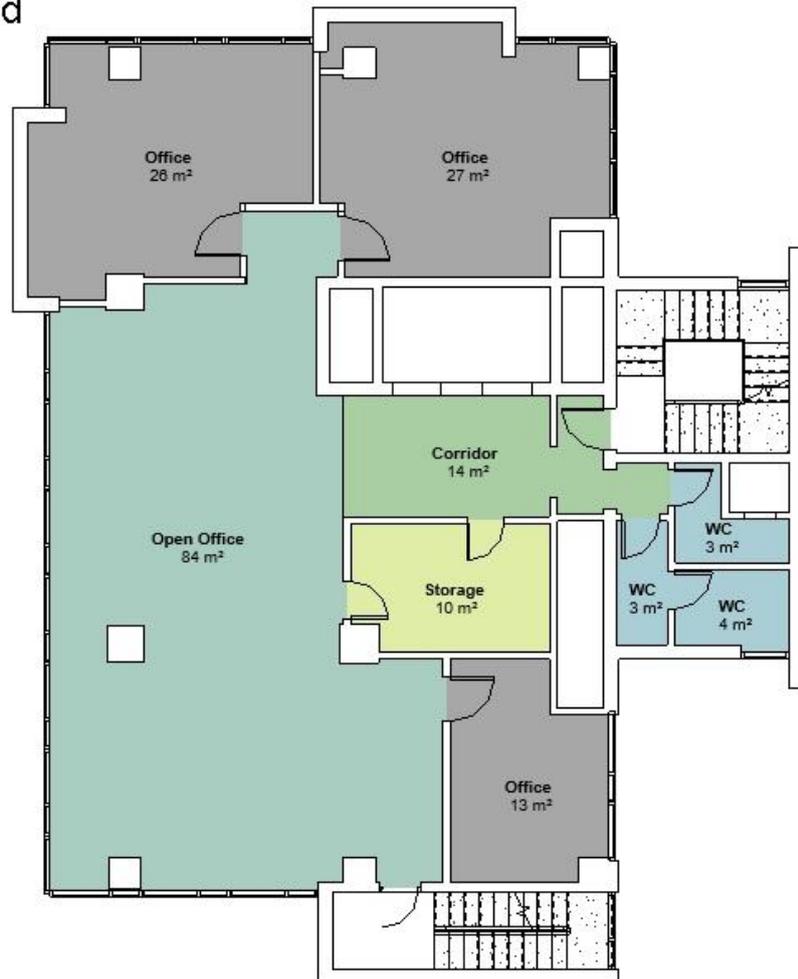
Level +21.95 Floor Plan of KPMG Building (Author, 2021)
